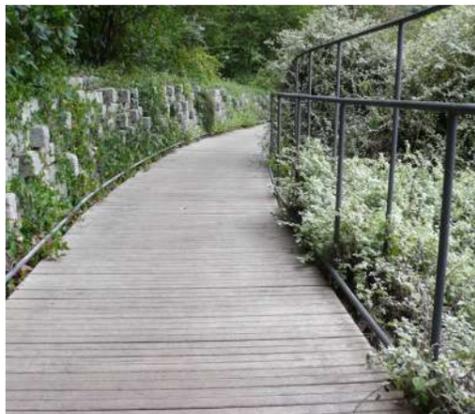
ELEVATED TIMBER BOARDWALK
